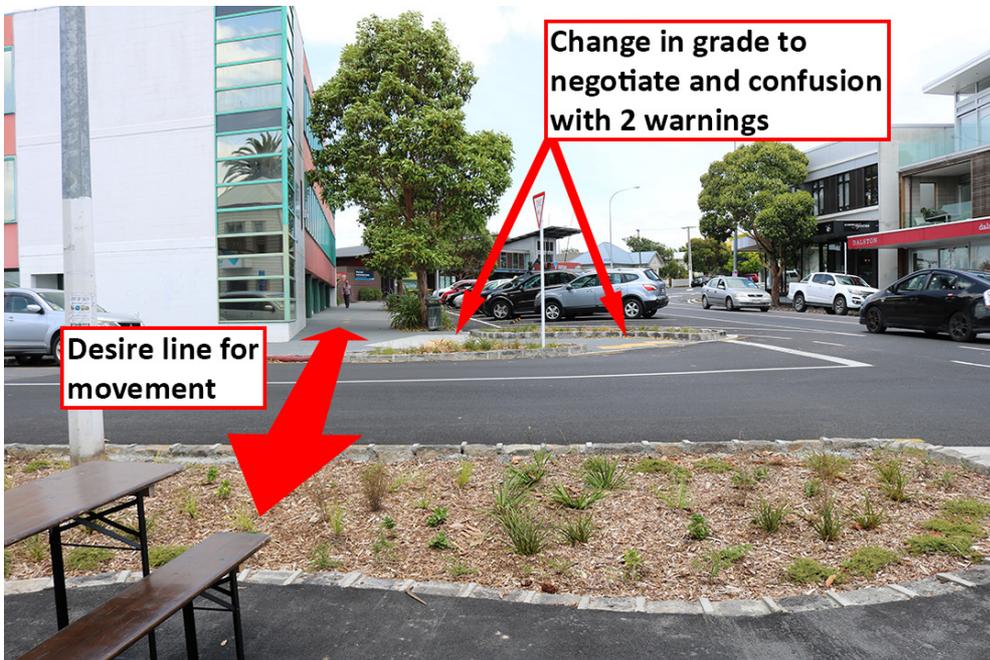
Photo showing desire line for crossing at Tutanekai Street
